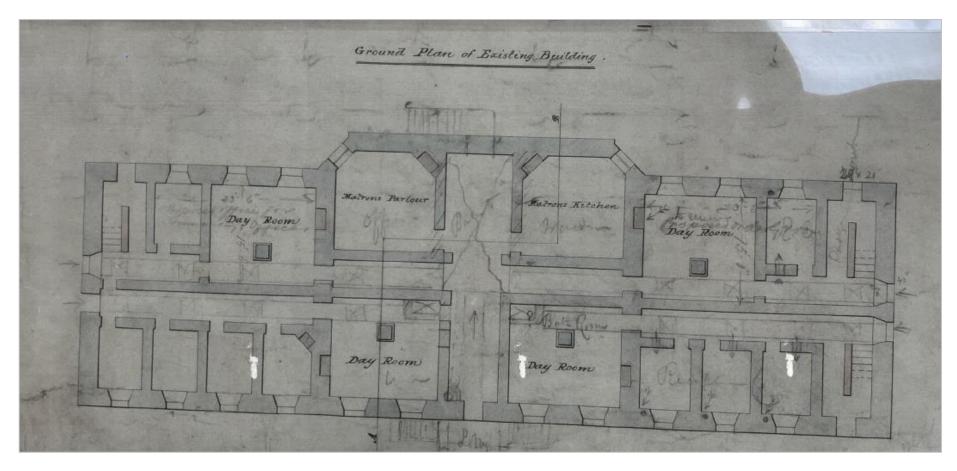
Plan showing the layout of the existing gaol building prior to its conversion for the Haverfordwest Police. This shows that not all rooms on the ground floor had been cells. Proposed use has been added to the plan in pencil. Plan ©County Record Office
